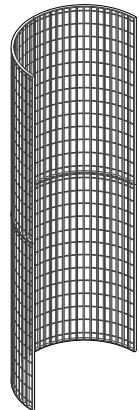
Construction detail - Compositions of exhibition structure modules | Axonometric views.
